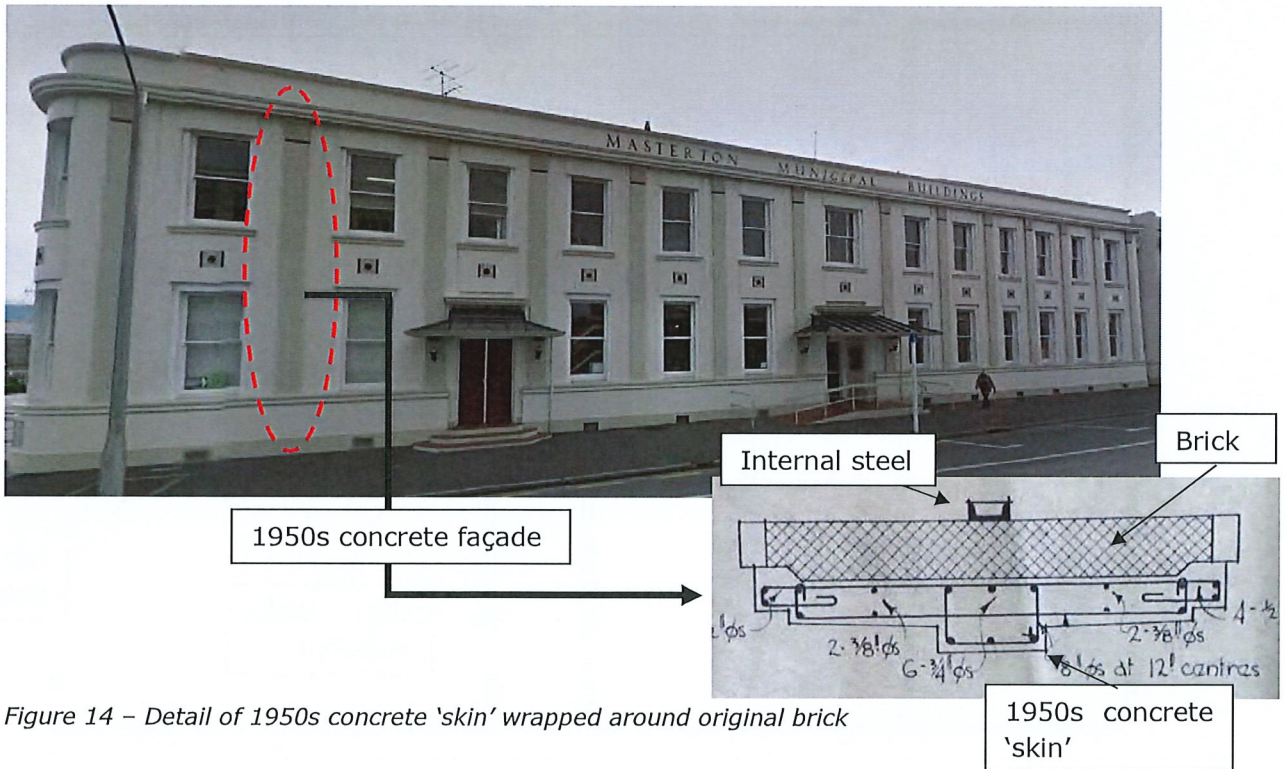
Detail of 1950s concrete 'skin' wrapped around original brick
